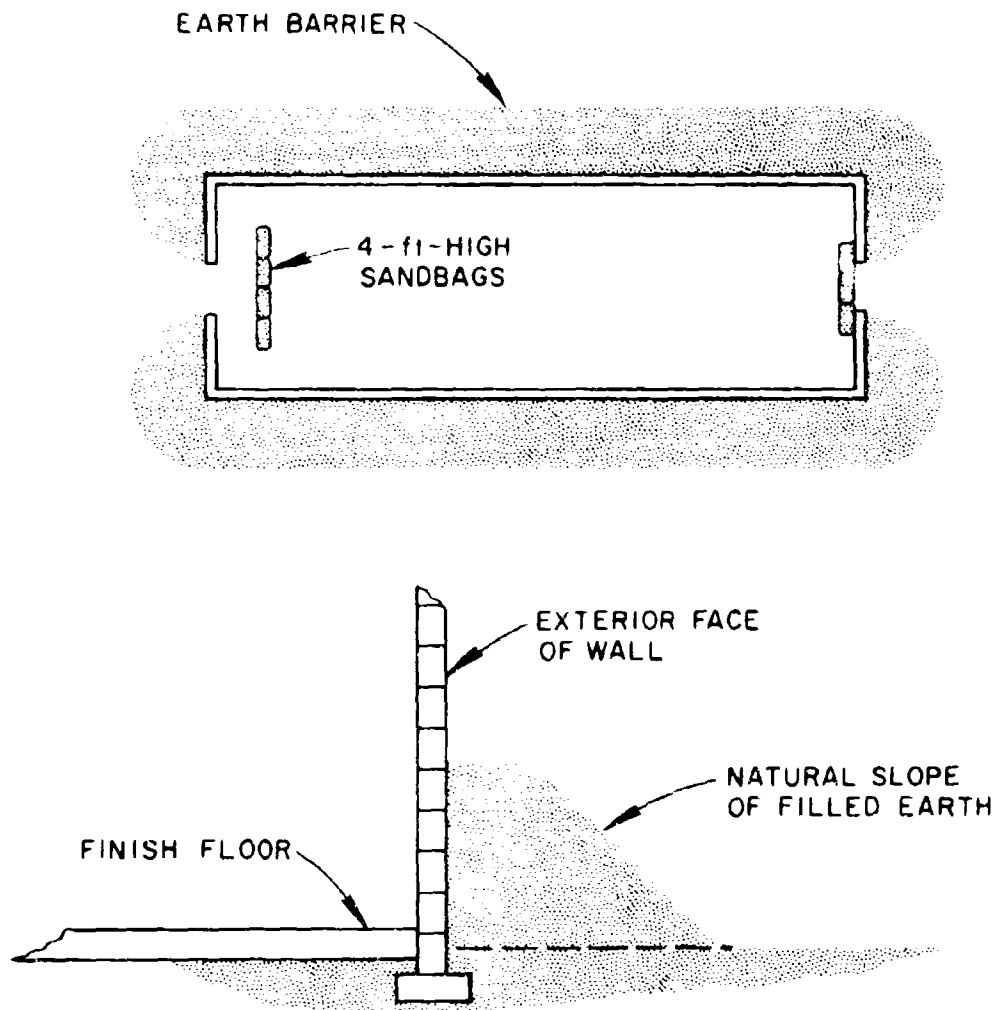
Mounding Earth Around a Barn With Masonry Walls.
